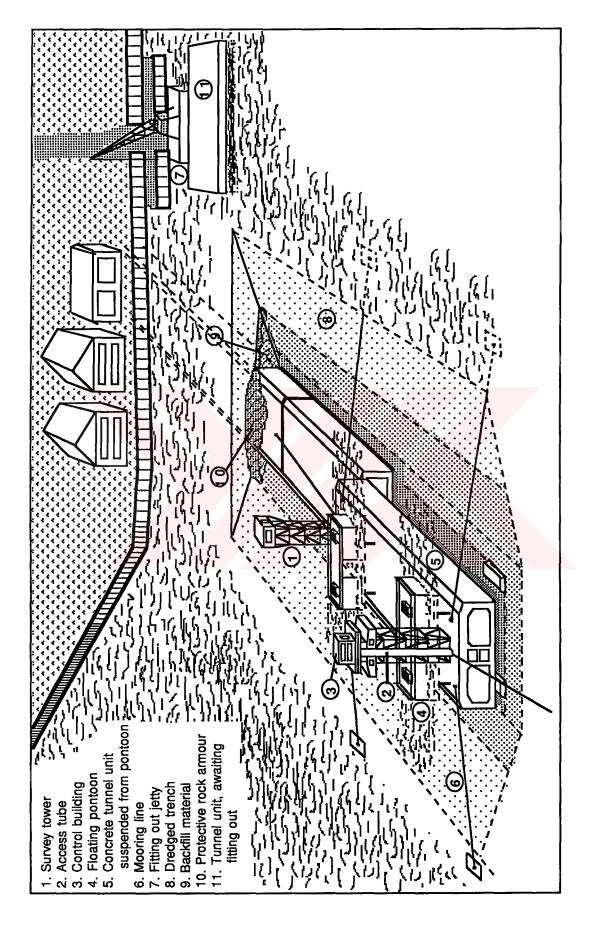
SUBMERGED TUNNEL CONSTRUCTION
